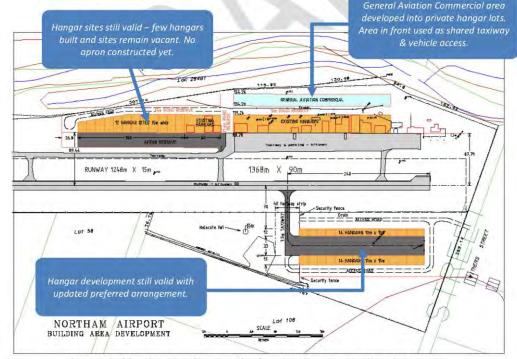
Building Area Development Plan from Northam Master Plan - June 2006
